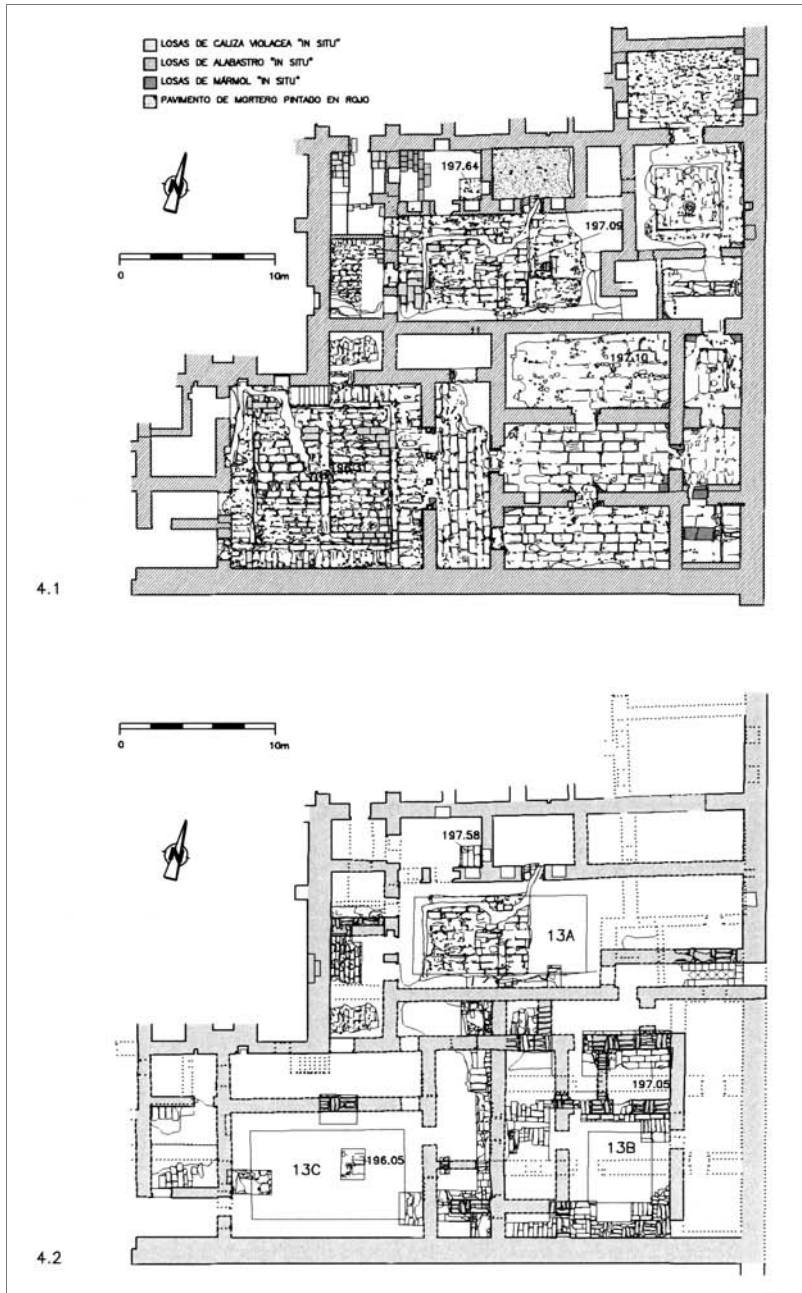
4.1. Plan of the House of Ja'far; 4.2. Pre-existing houses on the site of the House of Ja'far (13A, 13B and 13C).
